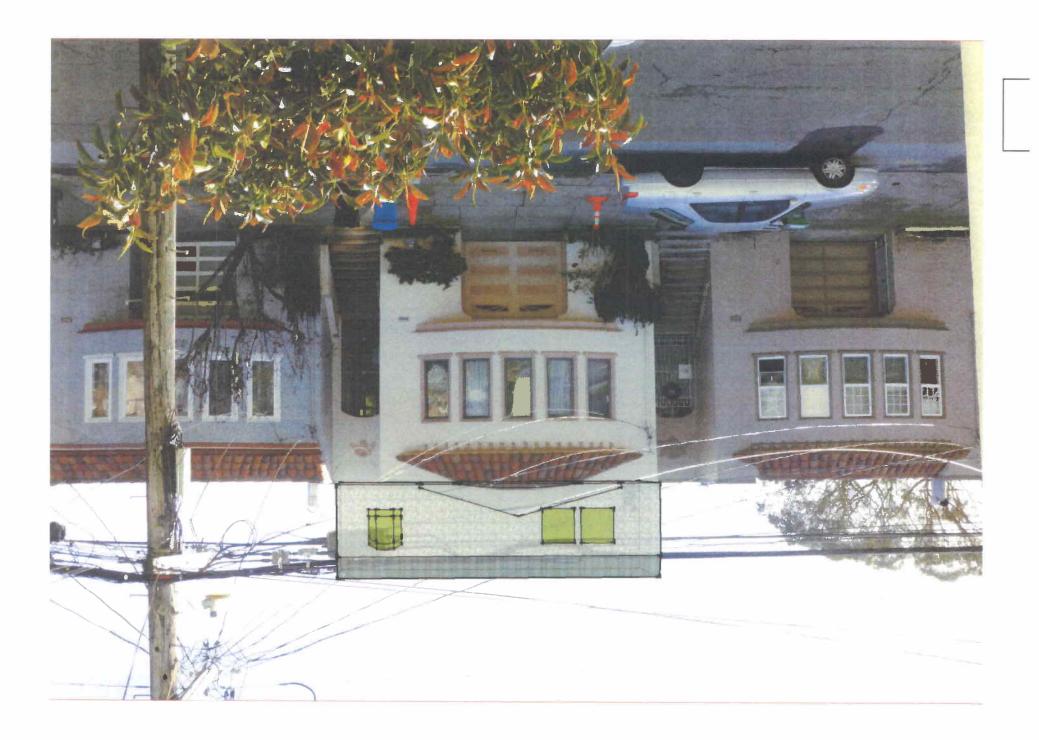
A: #1587 18th Ave Is Already 2 Feet Higher The Immediately Adjacent Buildings East-Facing 1500 Block Face to West #1587
